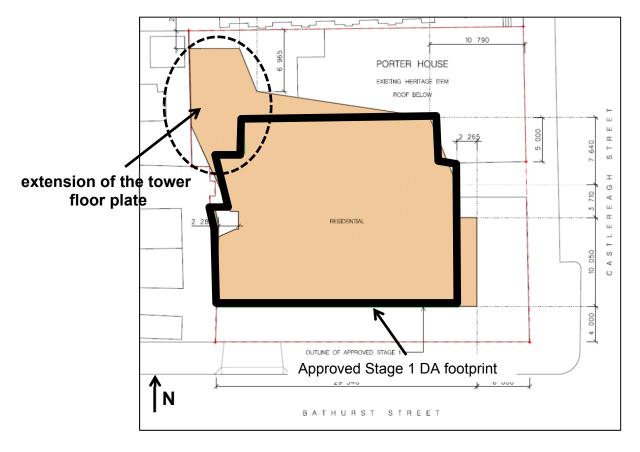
A typical tower floor plate illustrating the locations where variation is proposed to the Stage 1 building envelope
